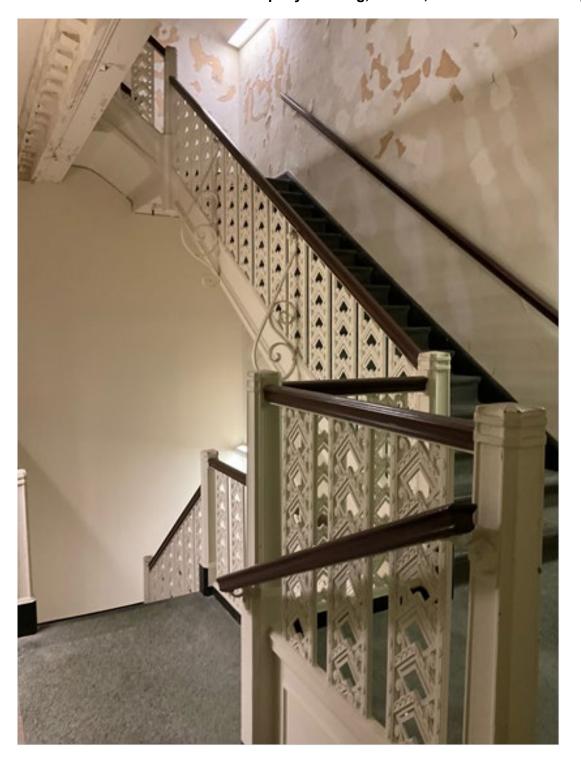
of 14: Marshall Field & Company Building, interior, First floor East stair at lobby, facing northwest
